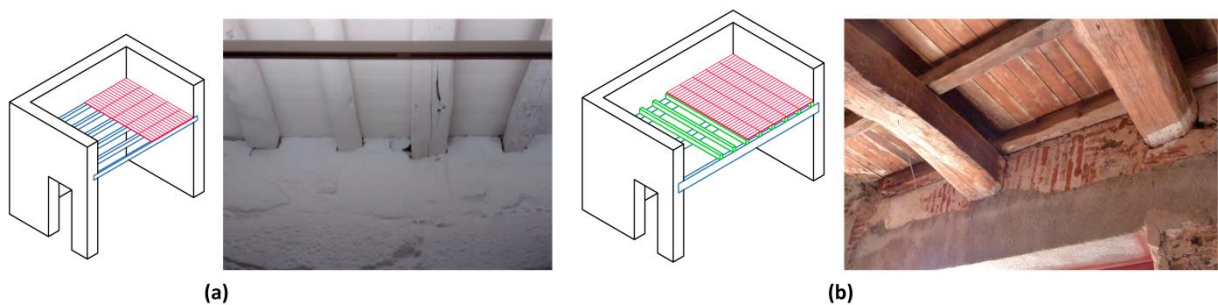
(a) Typical layout of traditional timber floors: wooden beams and board sheathing – example observed in Porto, Portugal; and (b) two-way traditional timber floor with secondary set of timber joists – example observed in Vila Real de Santo António, Portugal
